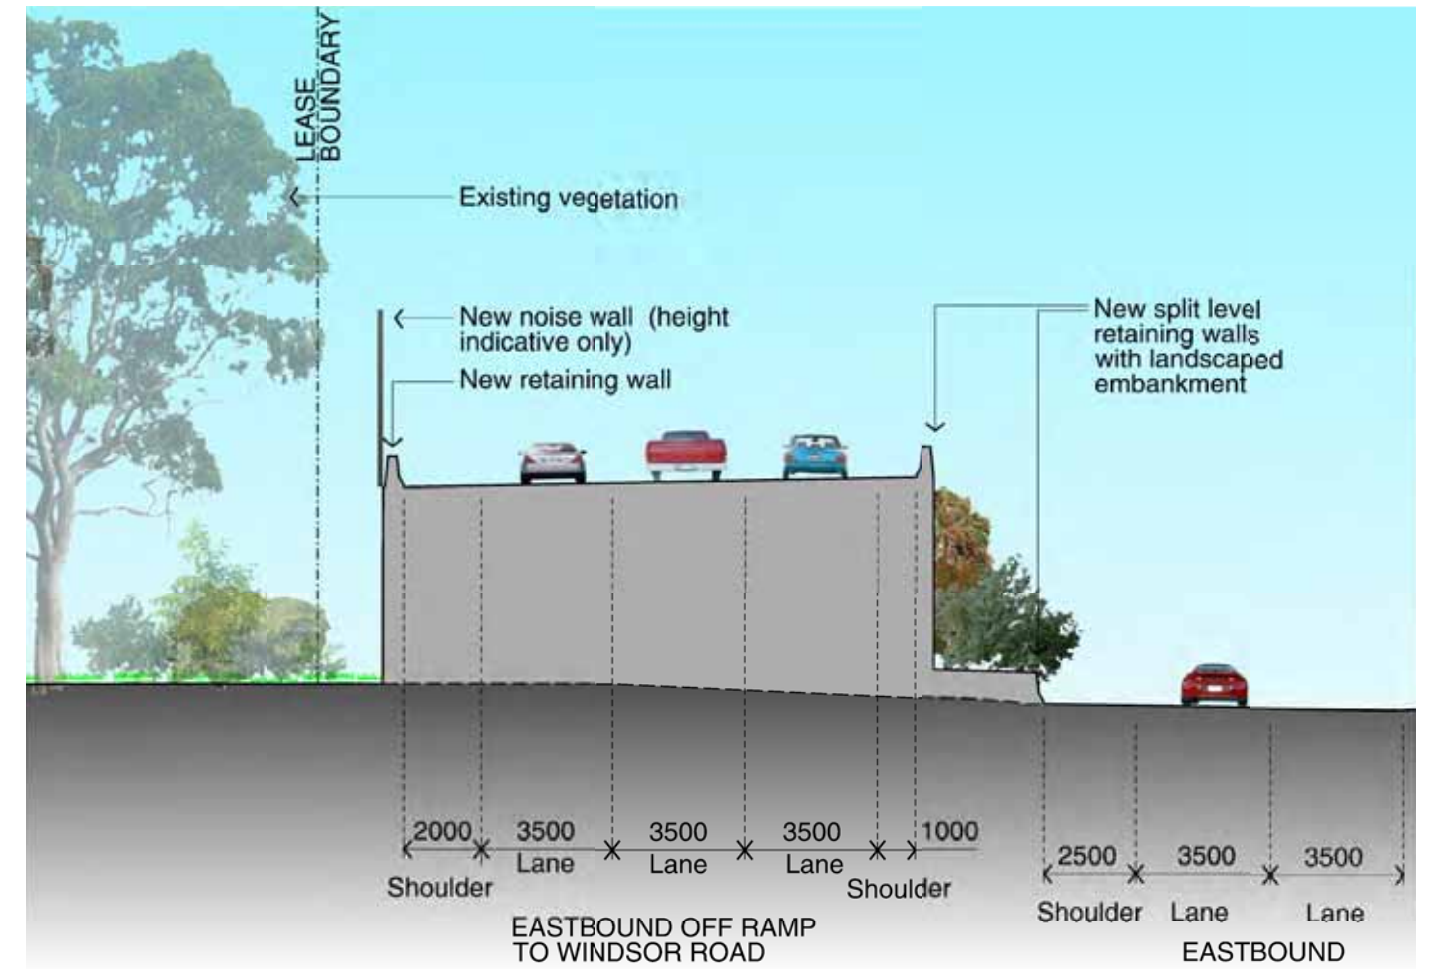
Stn 3850 Windsor Road off ramp (eastbound) - Proposed
